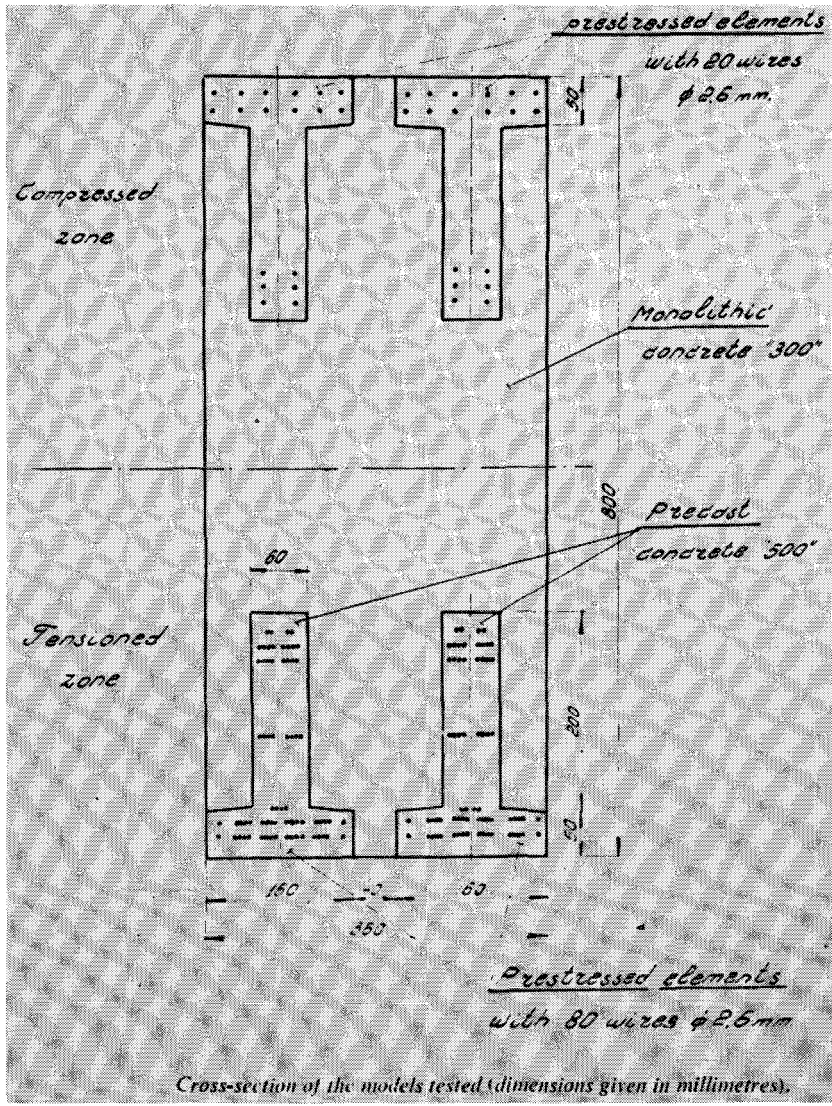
Models for determining the effect of precast monolithic construction, where precast elements are used for forming and to help developing the tensile strength of in-place concrete.
